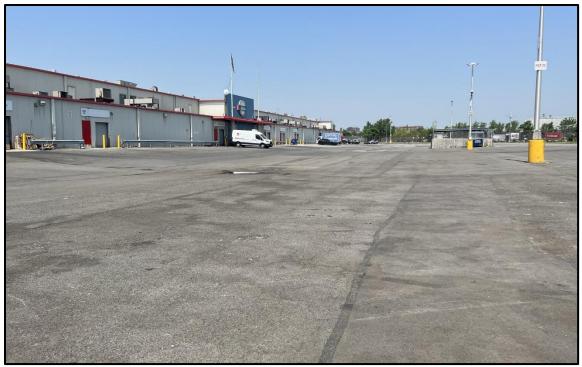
Facing south in the northwestern portion of Site; areas of pavement repairs completed in June and September 2023. Minor cracking present.
